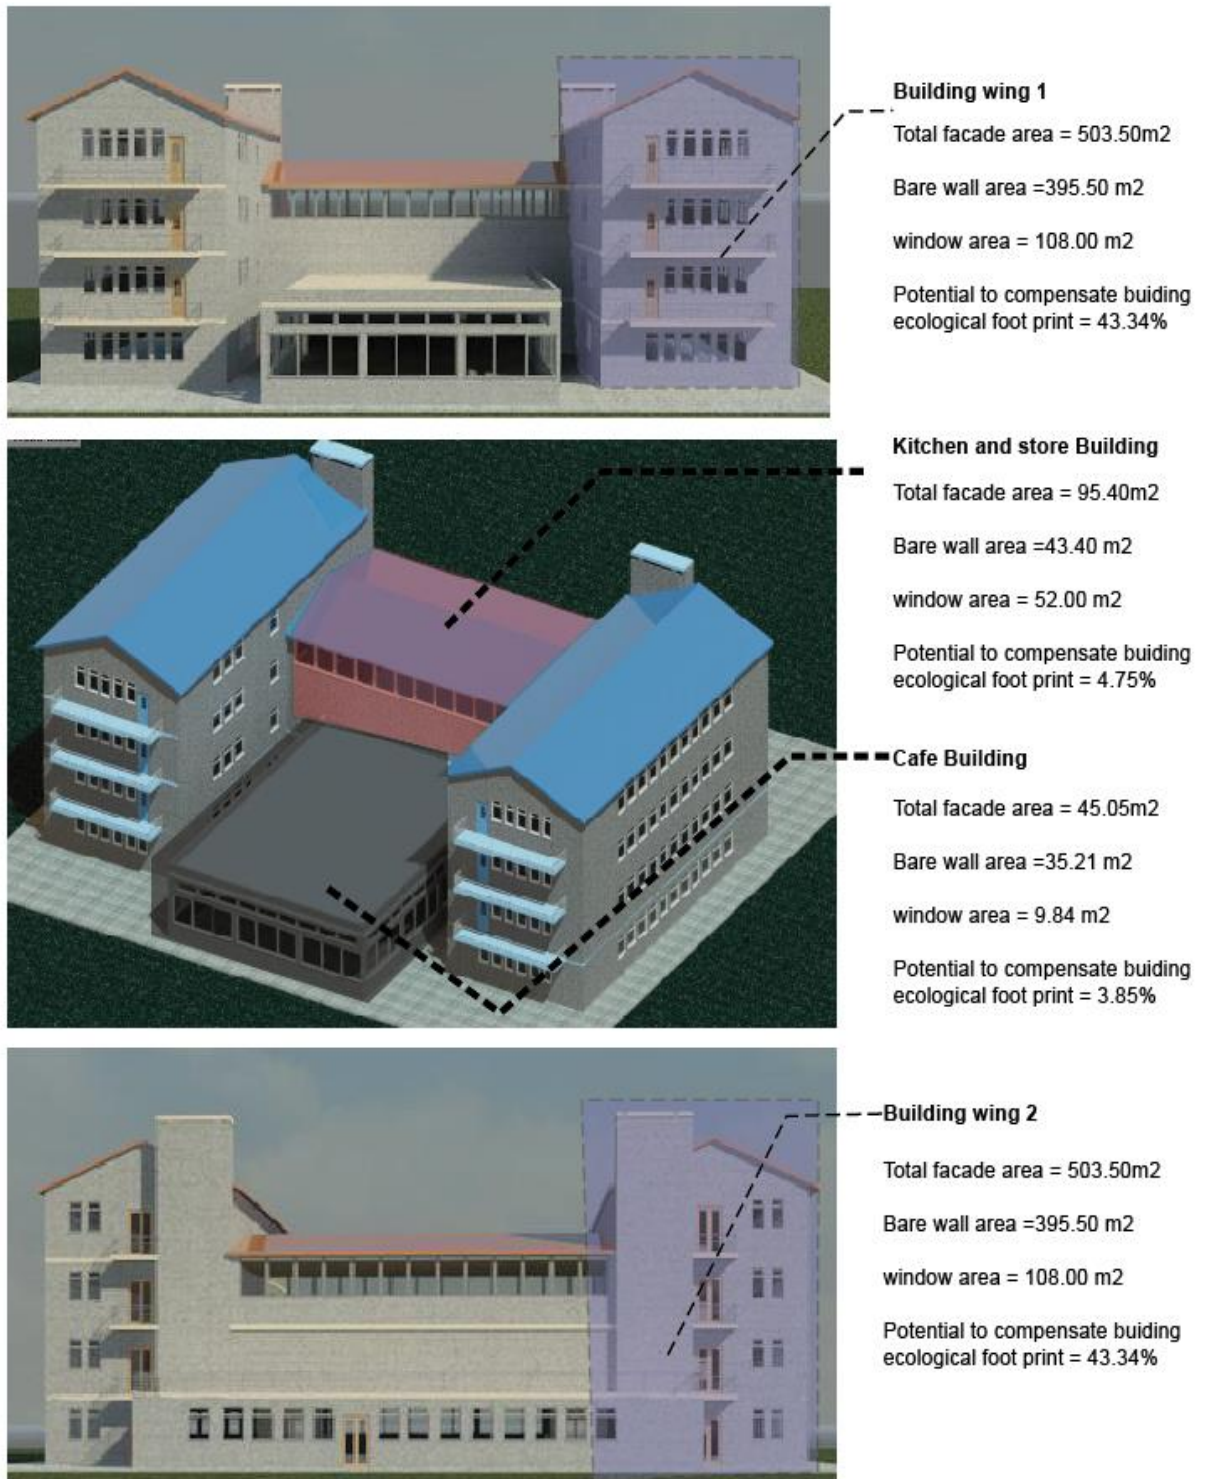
External surfaces bare wall potentials of Cafe and dormitory building,
